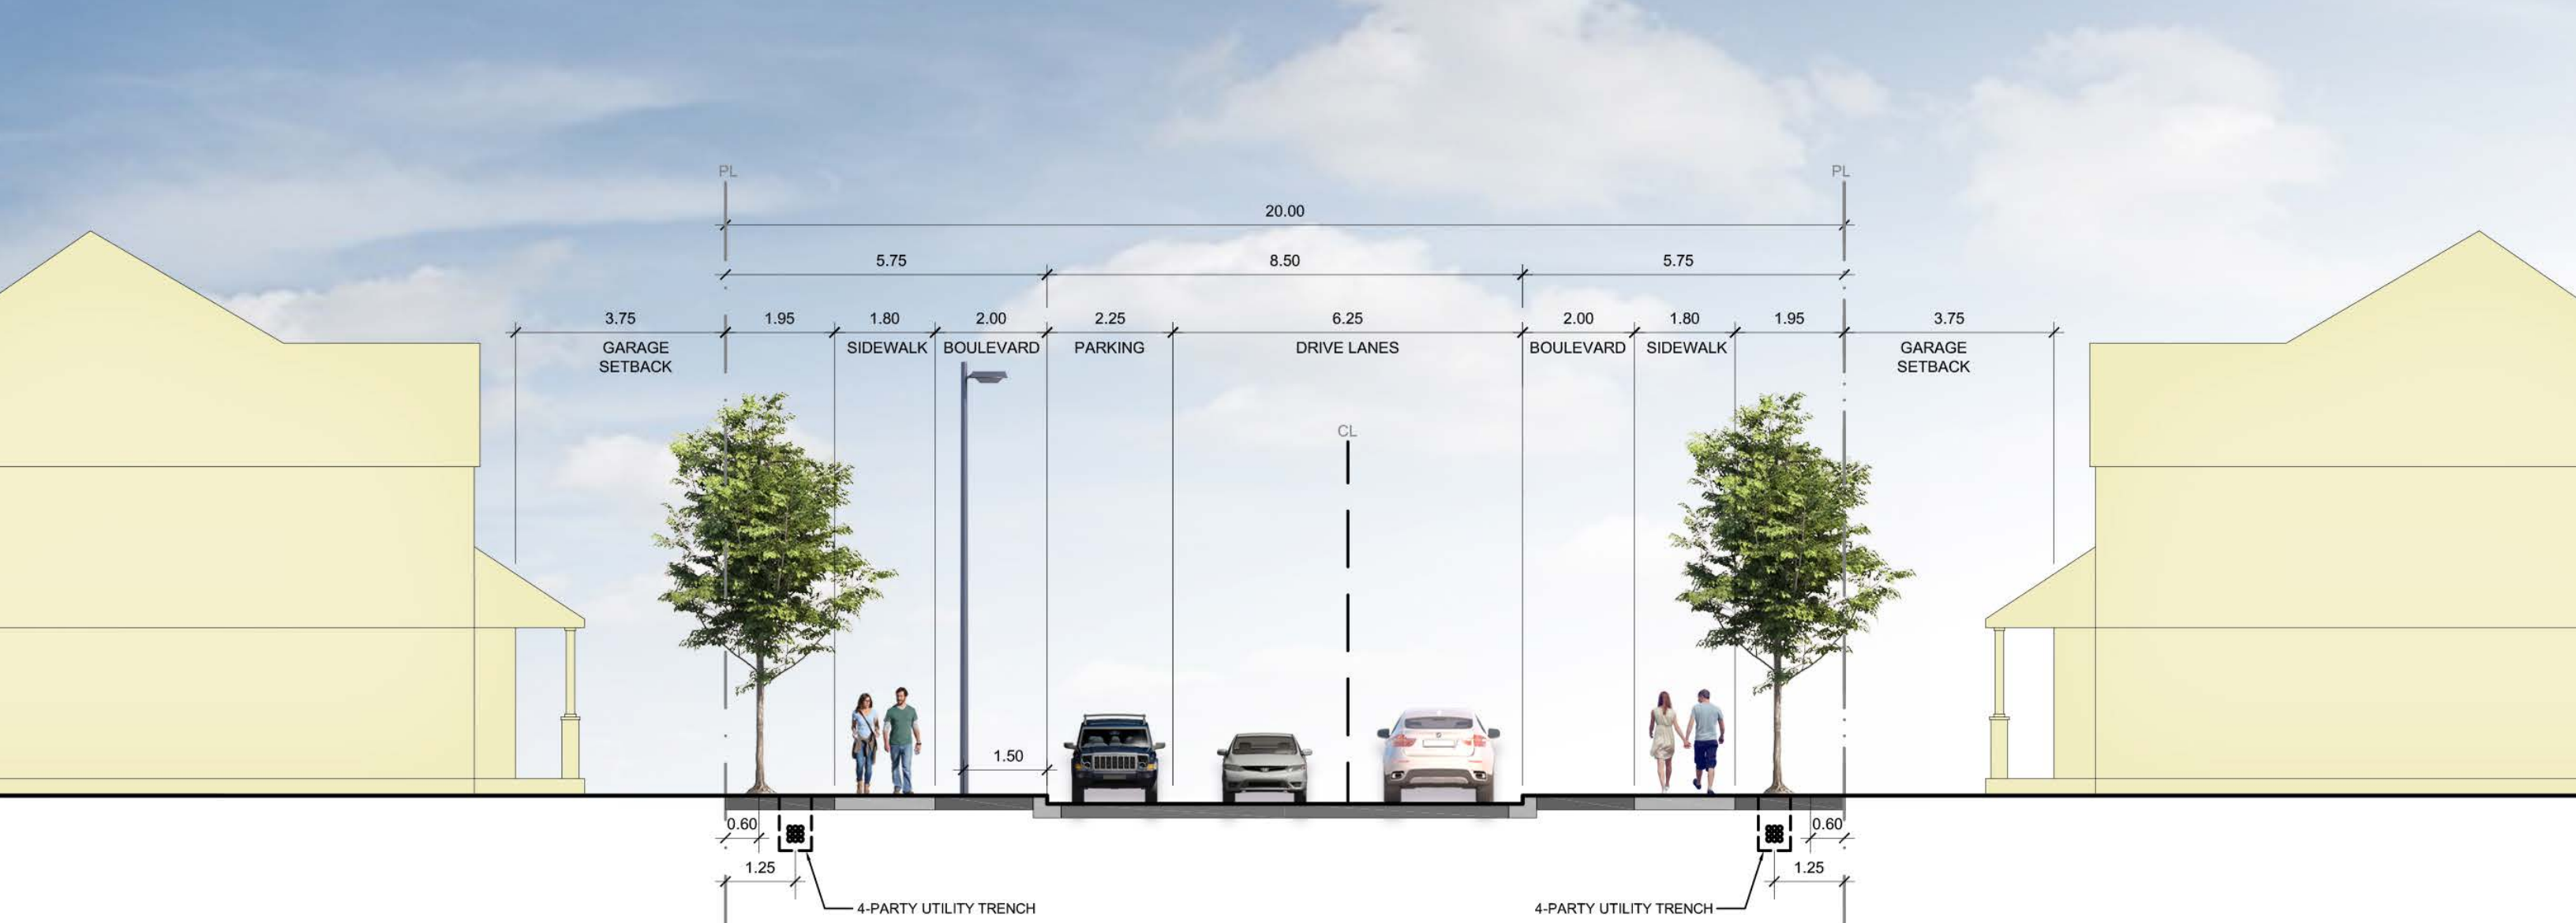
Local Road (Typical 20.0m Right-of-Way) Cross Section
